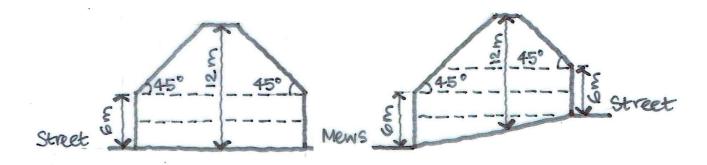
Typical sections through a flat lot and a sloping lot showing the building envelopes.
